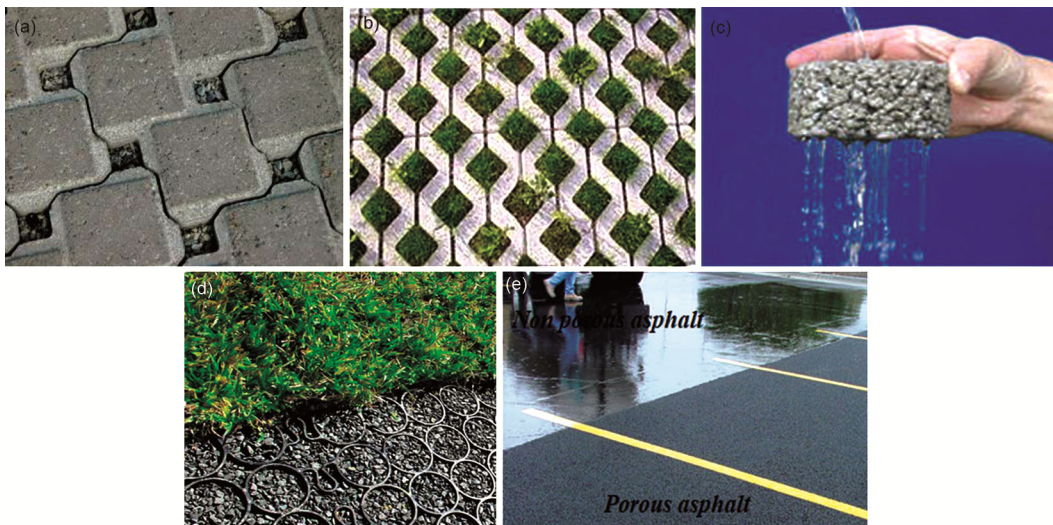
Types of permeable pavers; (a) Permeable interlocking concrete pavers, (b) Open grade pavers, (c) Pervious concrete, (d) Plastic grid pavers, and (e) Porous asphalt.
